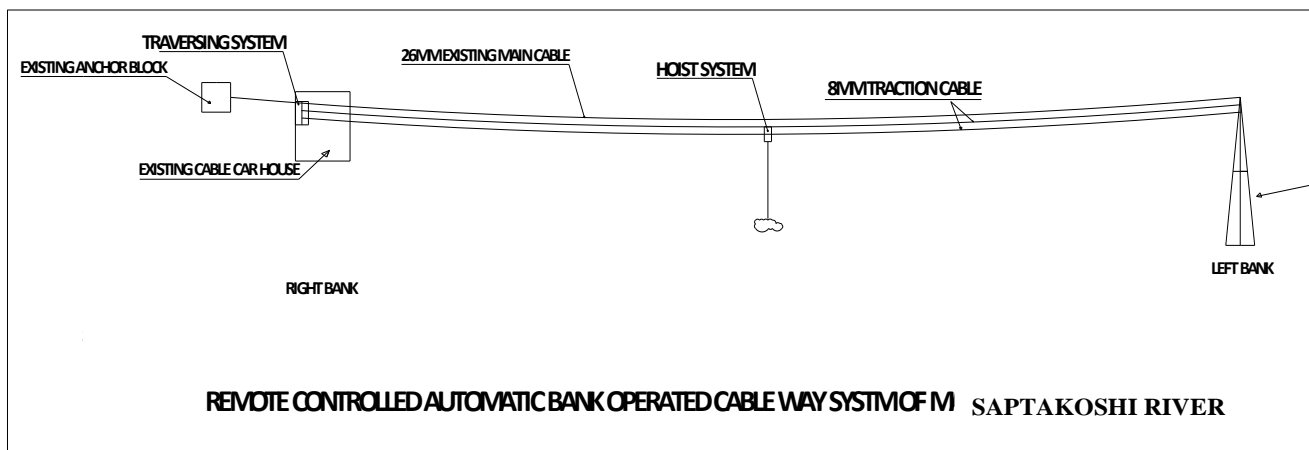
Elevation Drawing for cable car house construction at Saptakoshi, Chatara
